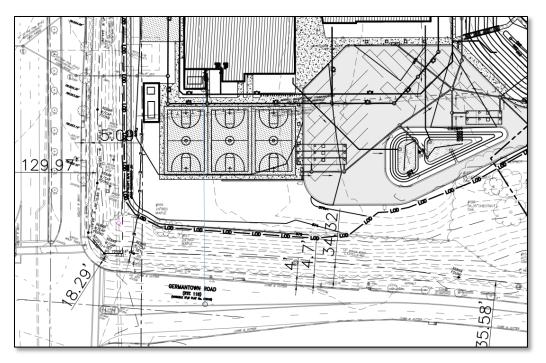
Non-structural Elements Adjacent to Right-of-Way
